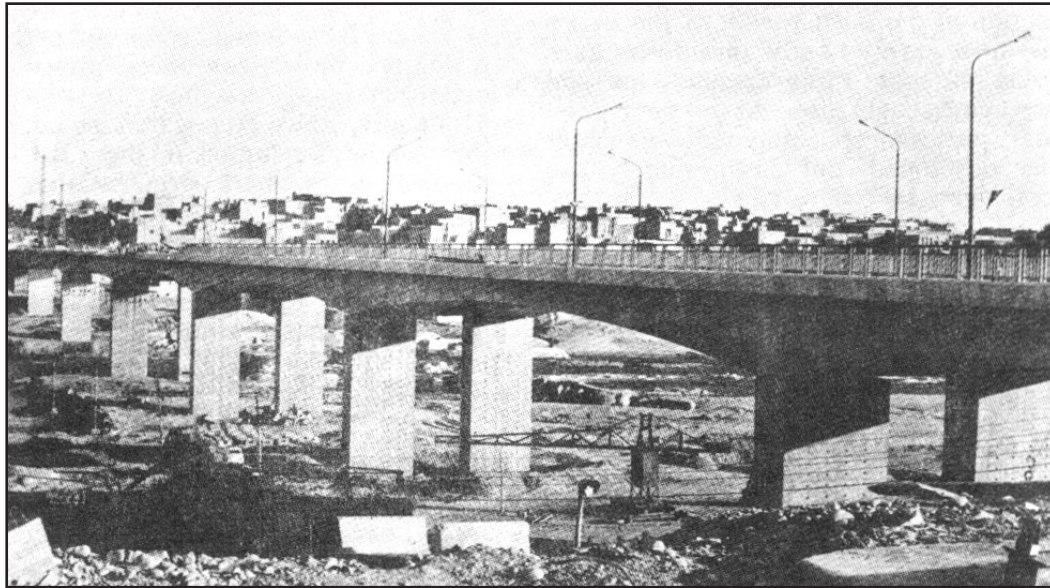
The Dezfoul Bridge in Iran, a continuous span structure built the free cantilever method
